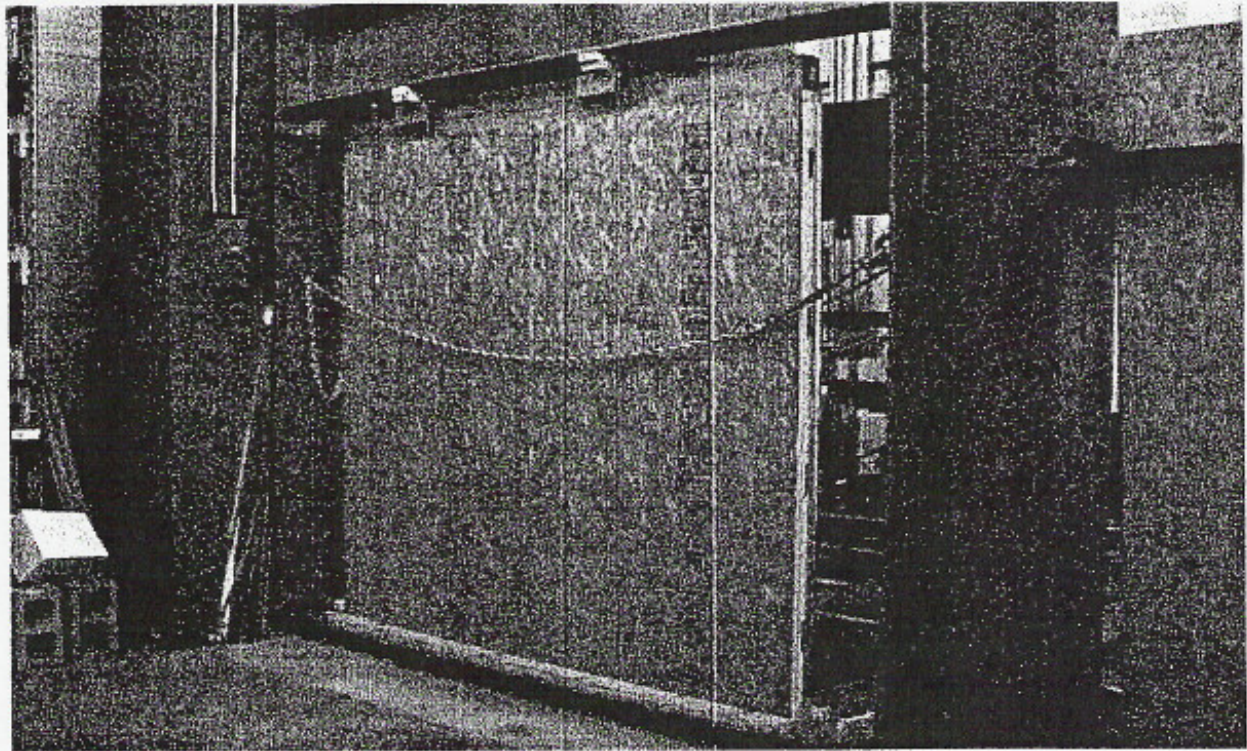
Test Setup for Racking Loading on 8' OSB-OSB Panel
